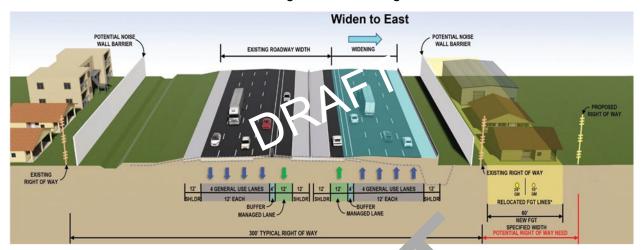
Typical Section Segment 2 - Build Alternation 3 - Videning to the East
